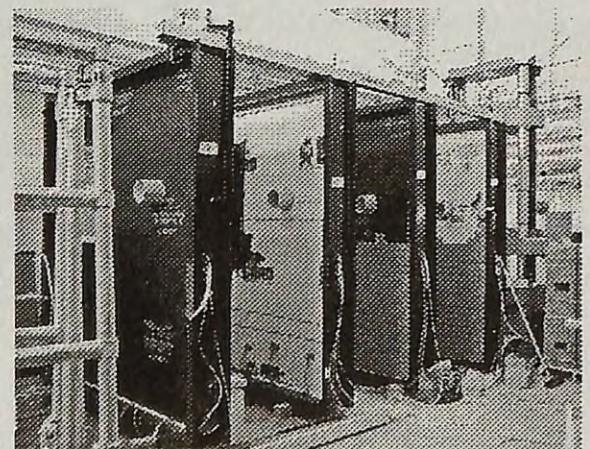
Full-scale 2400-mm by 2400-mm test specimens shown at different stages of fabrication. Four of the 17 wall specimens included brick veneer.
